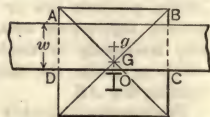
Square Supporting Area. Wall and Eccentric Isolated Load
